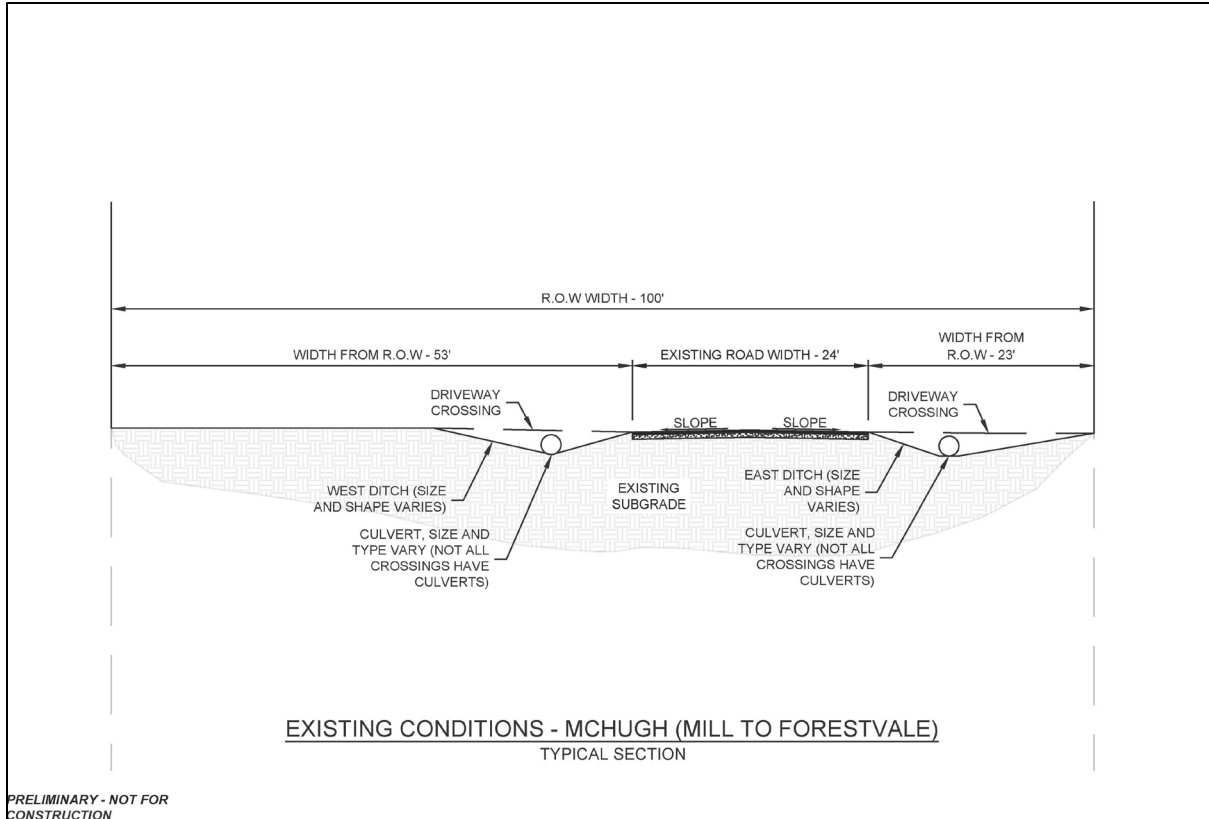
Typical section depicting existing conditions on McHugh Lane between Mill Road and Forestvale Road.
